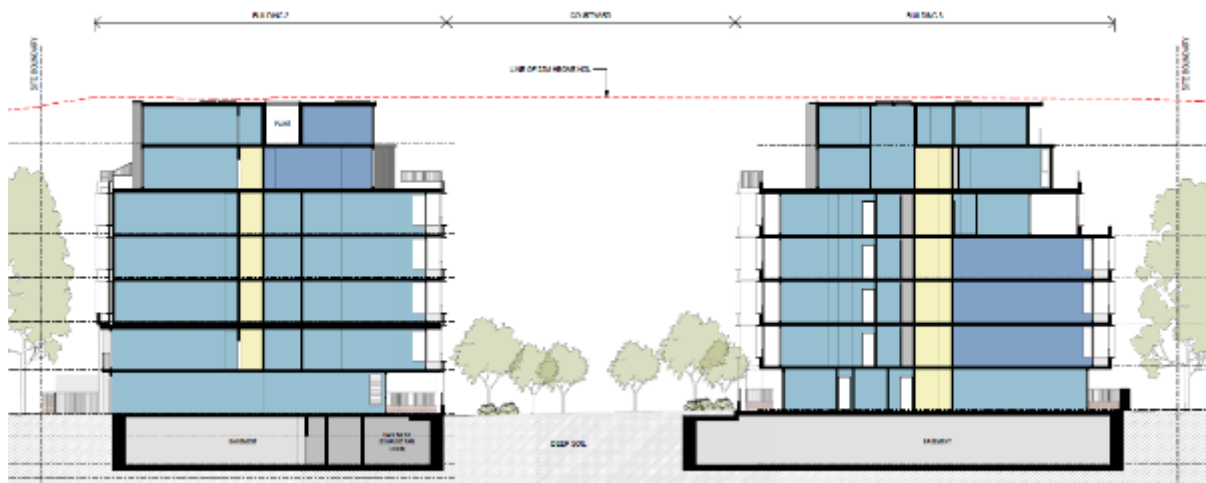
Section through buildings 2 and 3, showing height in storeys and 22m height limit
